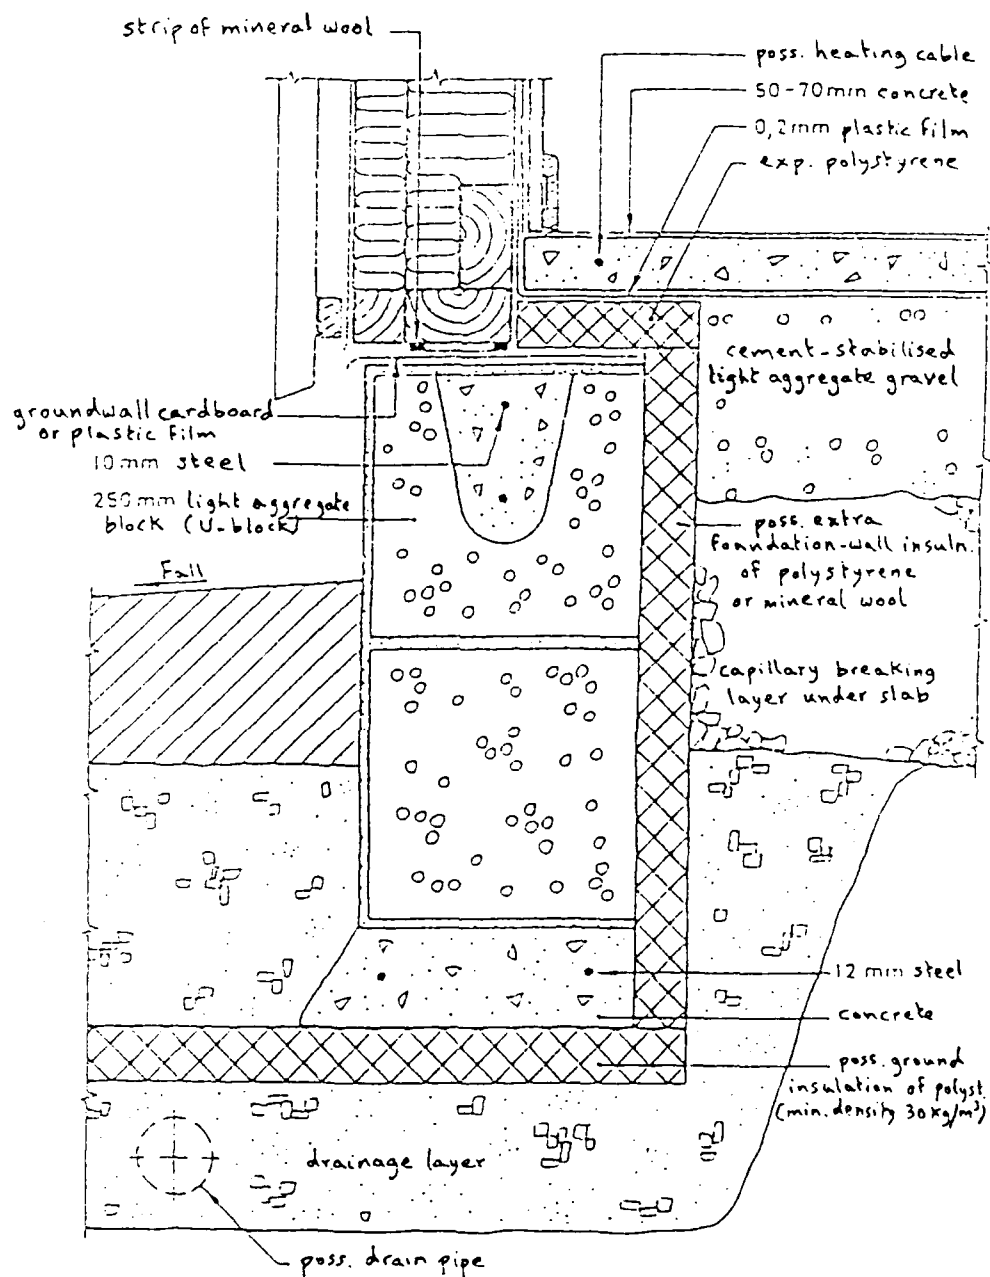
Concrete slab with foundation wall of light aggregate concrete.
